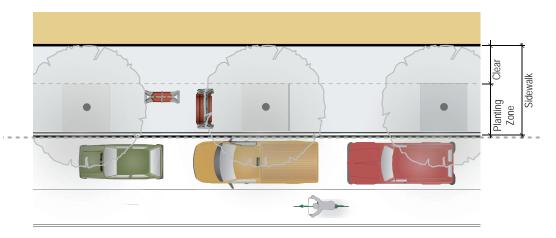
On-street parallel parking - standard design adjacent to the curb.
